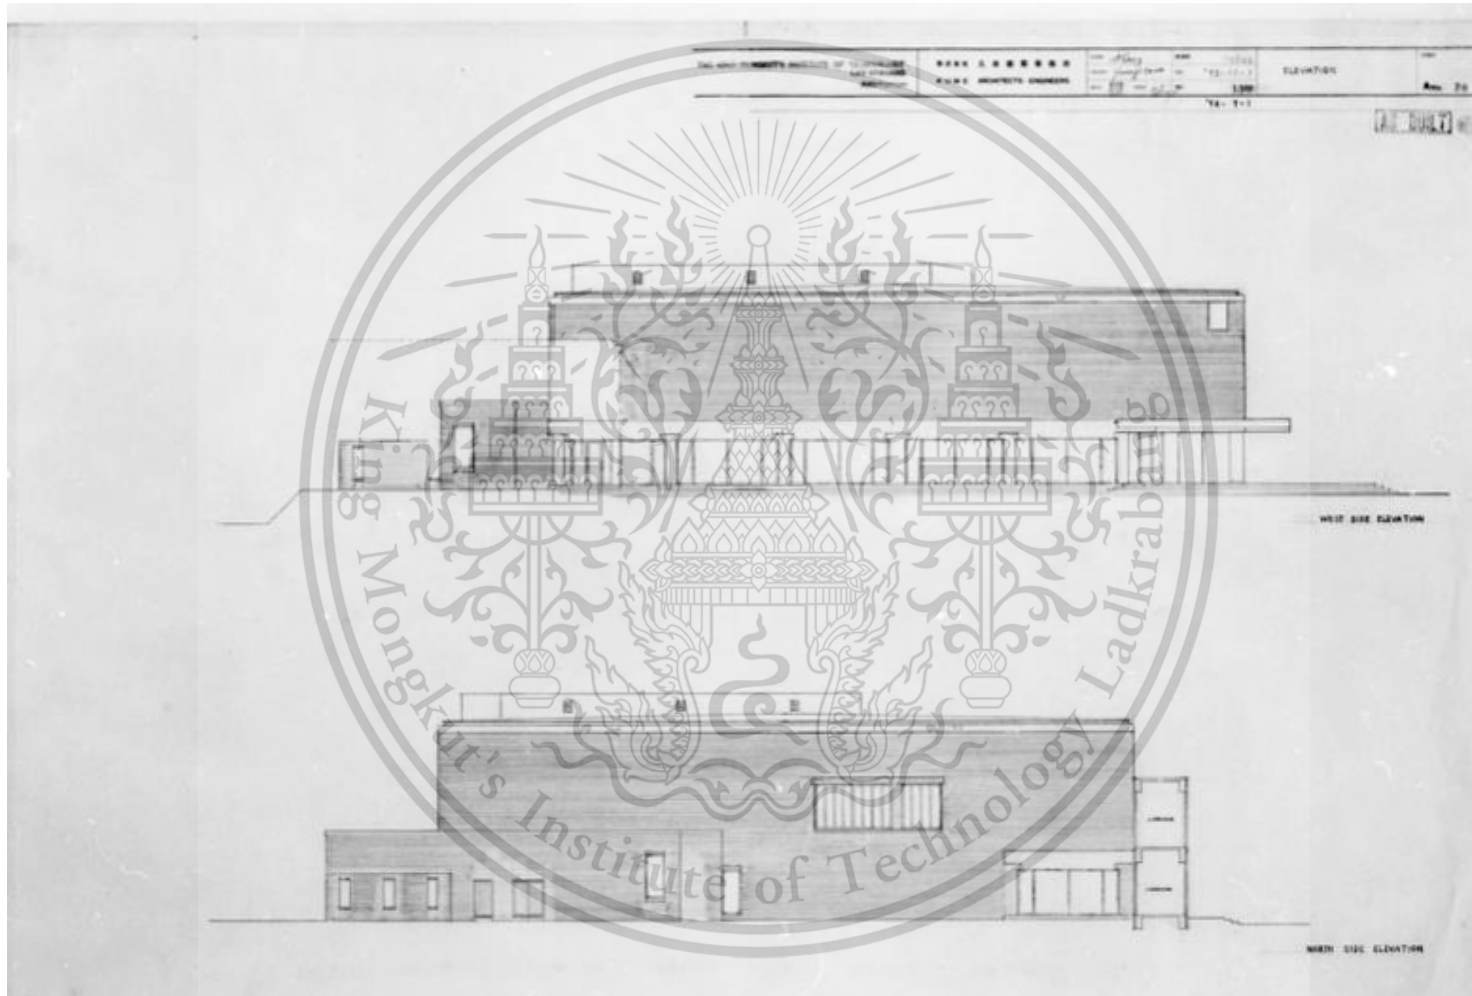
Original drawing of The auditorium (Elevation north and west side)
